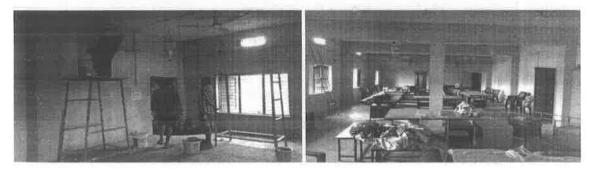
Painting work has been done in the common classroom, Government Higher Secondary School, Tundri.
